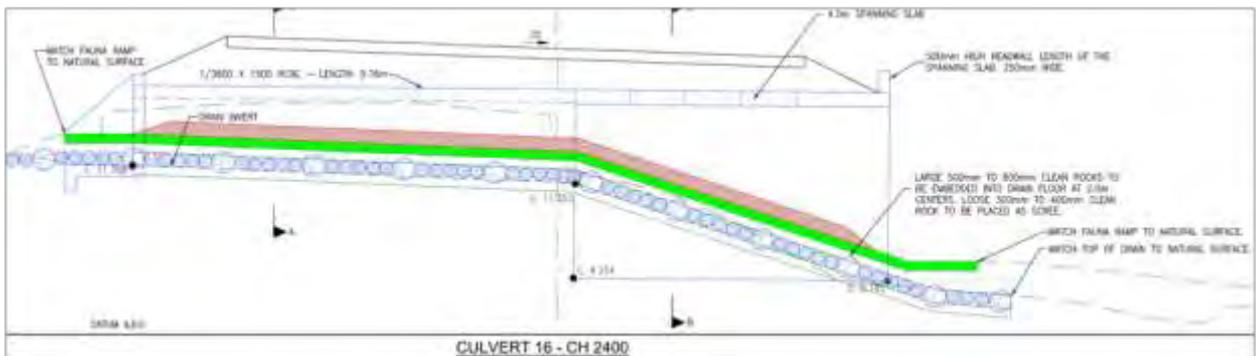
16 CH 2400 Fauna culvert long section showing location of ledges and rocks to retard stream velocity.
